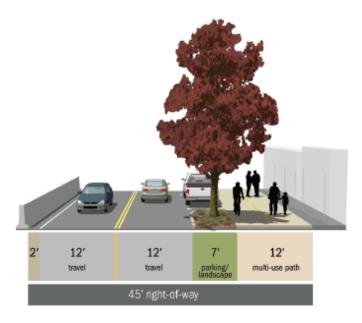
Figure X. Conceptual Cross-Section for Main Street - Milport Road to Beta Street within existing right-of-way (looking north)
